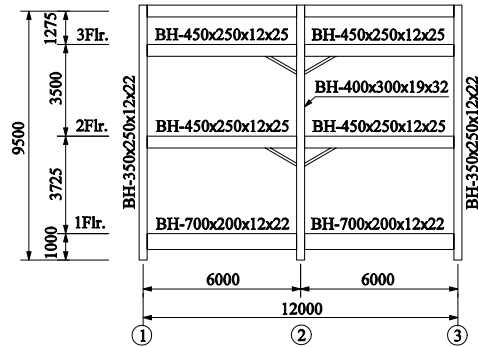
shows a general view of the building specimen, whose elevation and floor plans are presented in Fig. 12. The dimensions adopted for the frame are typical of low- to medium-rise construction in Japan. The frame has two bays of 6.00 m wide in the E-W direction and one bay of 8.25 m wide in the N-S direction. Each story is 3.50 m high, except in the third story where the columns were constructed up to the inflection points (1.50 m from the second floor). At the column tips, a strong horizontal bracing system was installed to simulate the rigid diaphragm action as well as to support hydraulic actuators.
